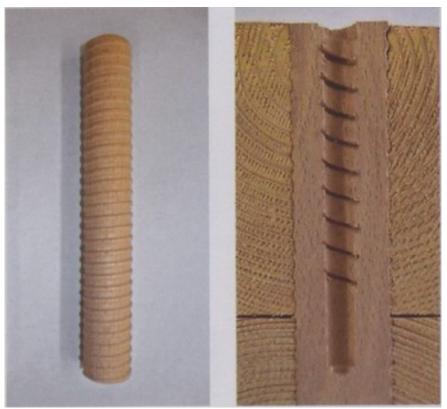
Detachability obsolete - Fasteners for the rigid construction method: Wood screw und Wooden dowel ©Detail, ©DETAIL
